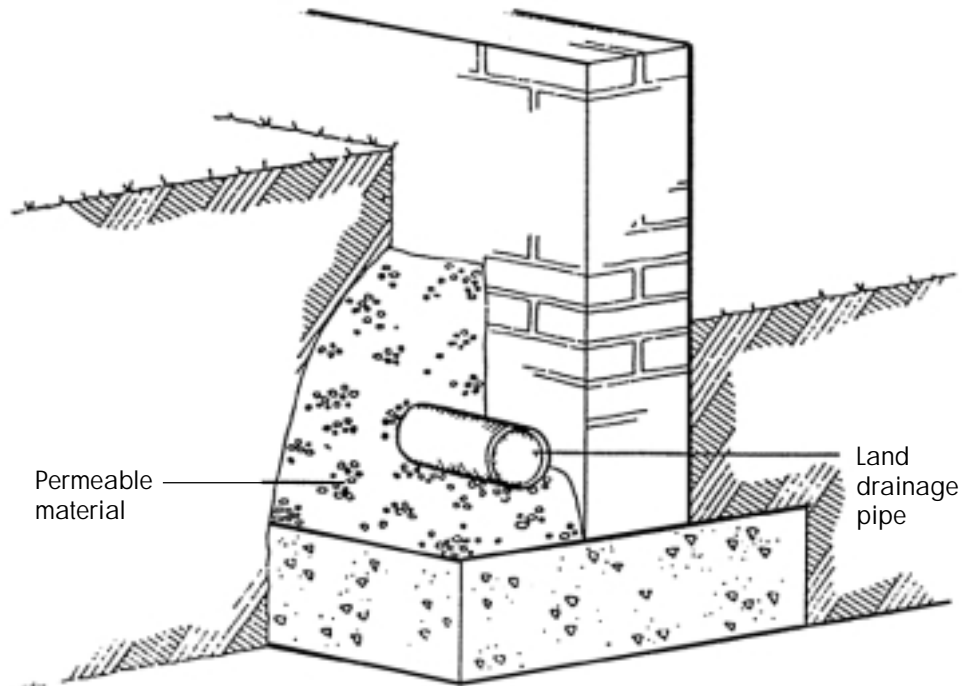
A LAND DRAINAGE PIPE BEHIND A RETAINING WALL
